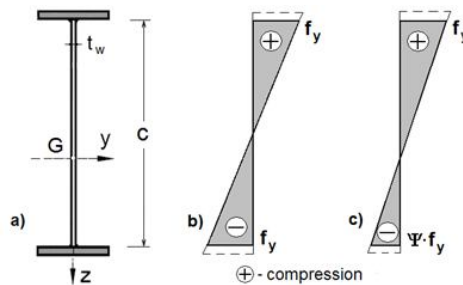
Diagram of normal unit stresses σ on plate girder web.
